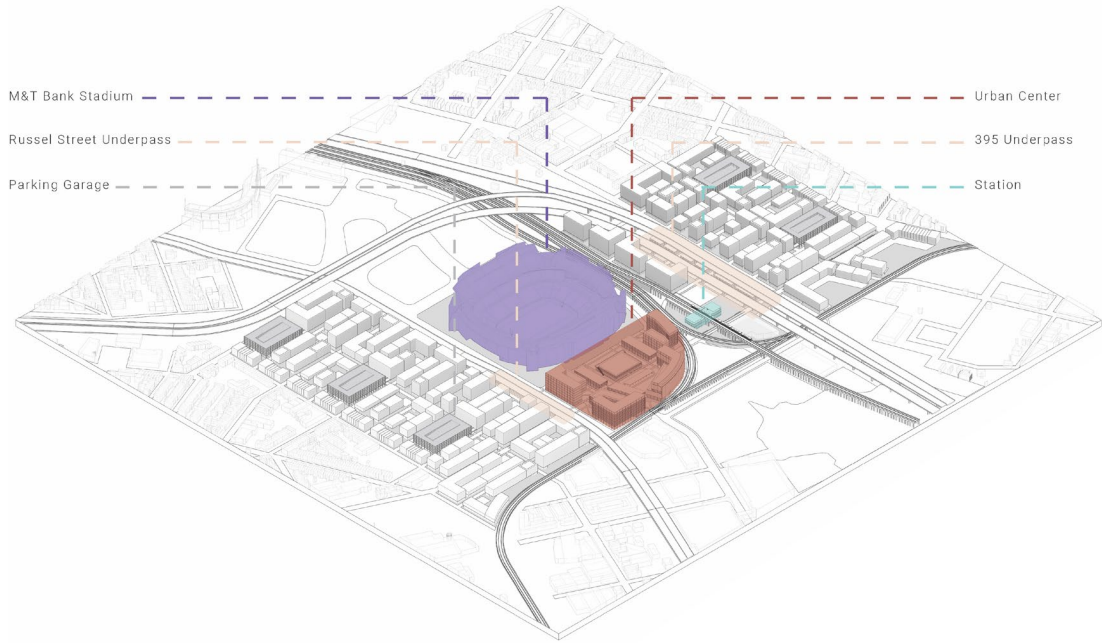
, Master Plan - Site Axon - Program (Source: Drawn by Author)
